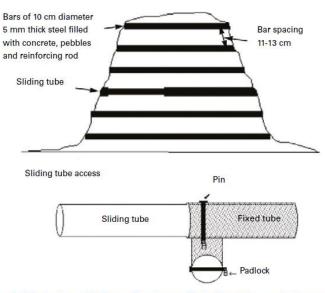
Grille design used in France. The tubes are filled with pebbles, steel and cement, which provide good resistance to cutting.
